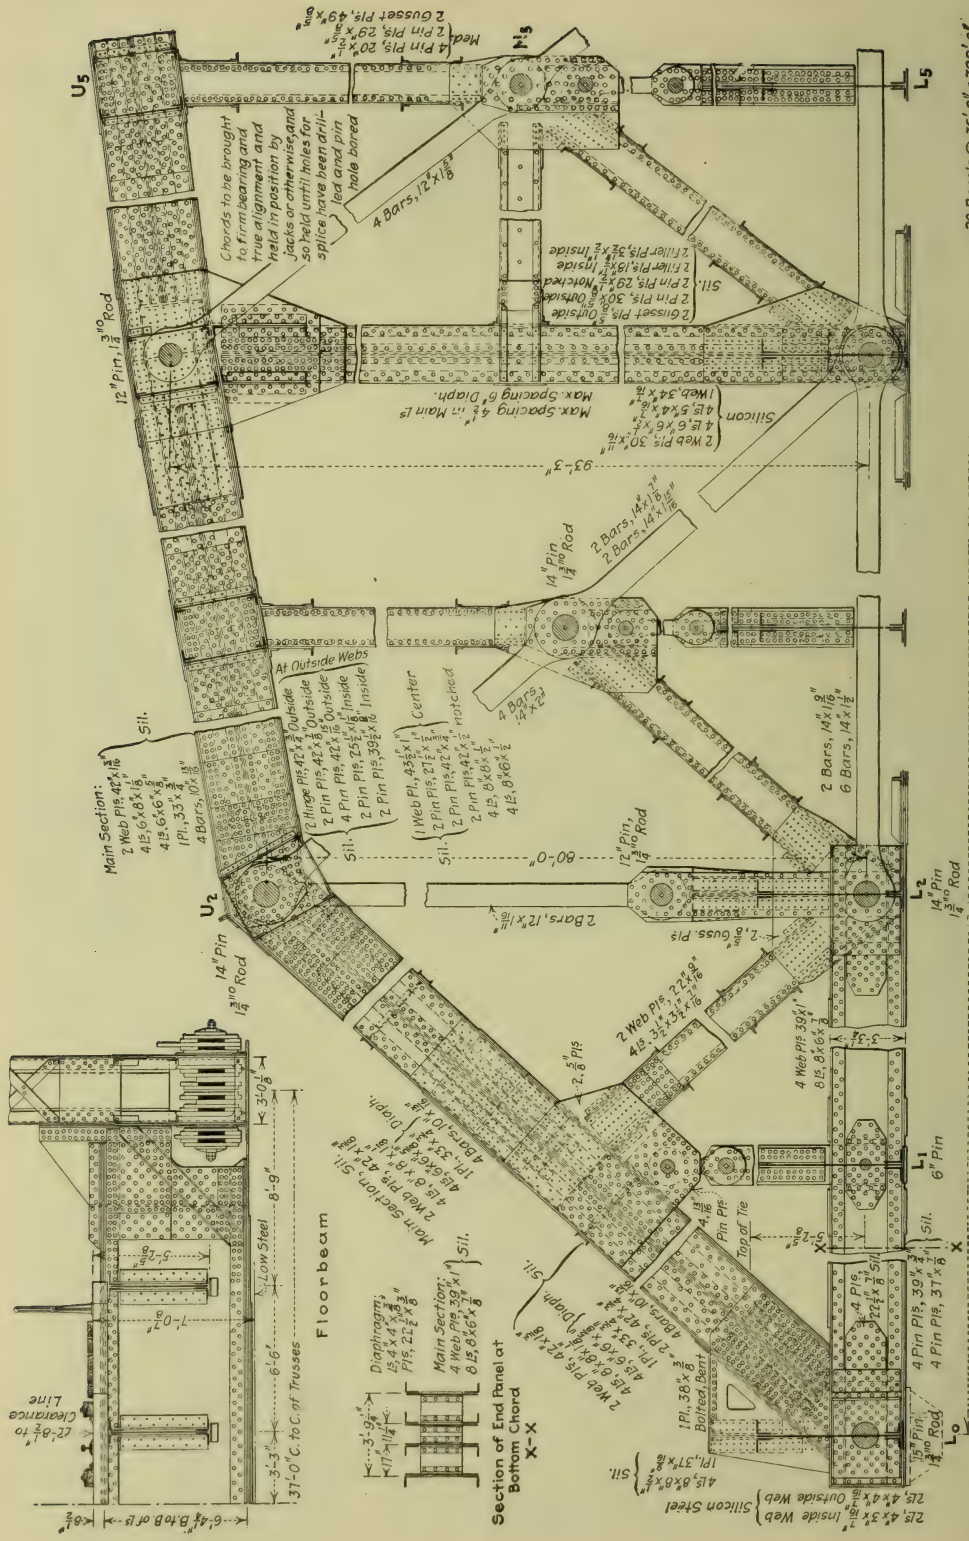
PART OF DETAIL DRAWING FOR 720-FOOT SPAN OF METROPOLIS BRIDGE OVER OHIO RIVER—A TYPICAL PIN-CONNECTED STEEL TRUSS BRIDGE
